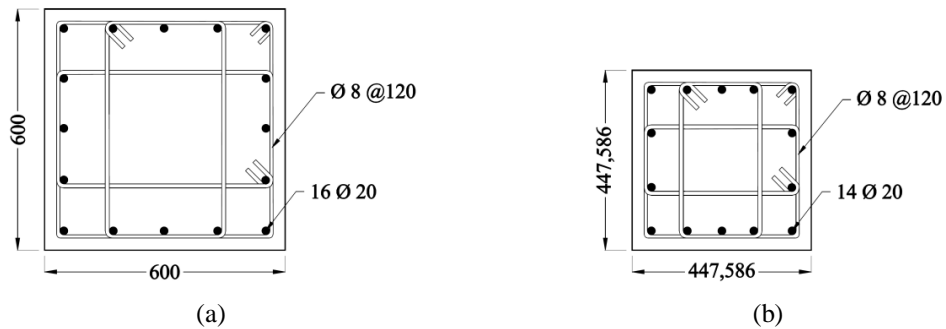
Columns cross-section details of the Modified 4 case of structure with eccentricity ratio equal to 0.143 (a) C1 and (b) C2, C3, C4 (all dimensions are in millimetres).
